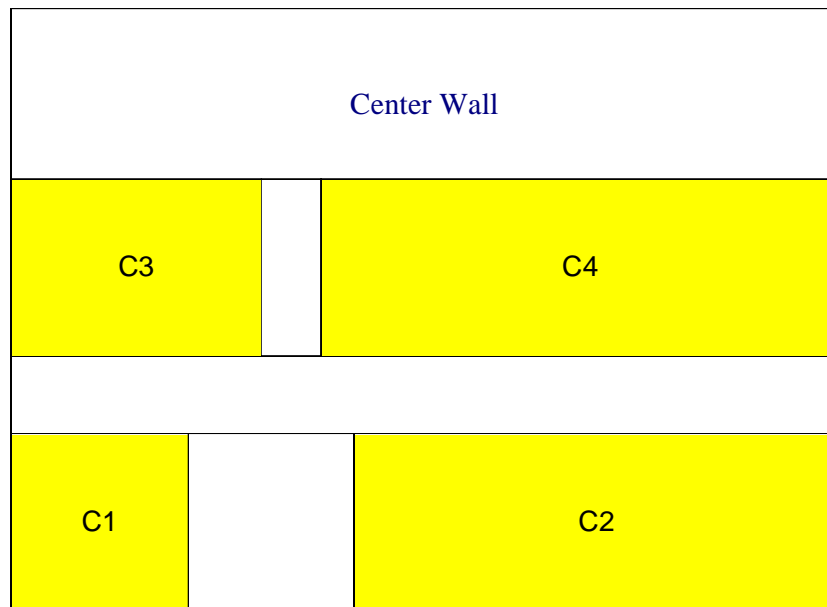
Piers of central wall using the pier-type collapse mechanism.
